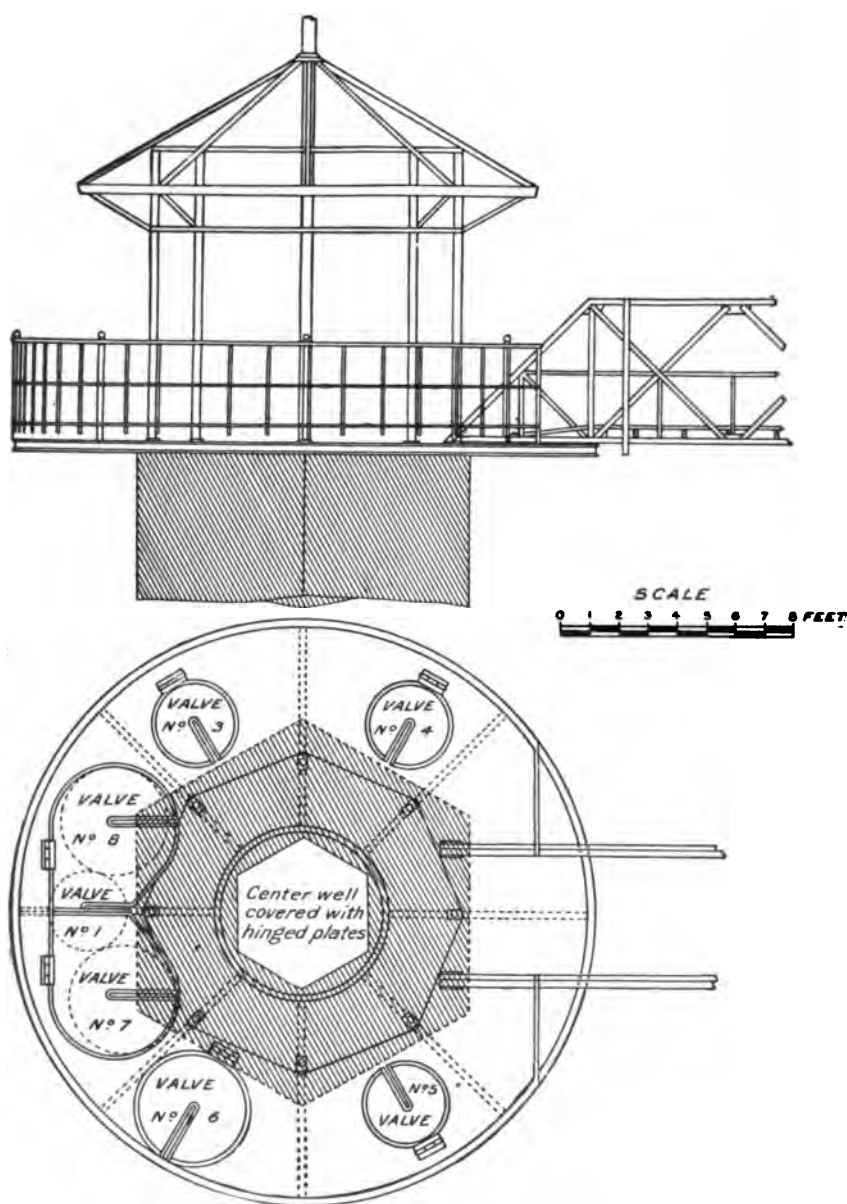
DETAILS OF TOWER OF SWEETWATER DAM.
